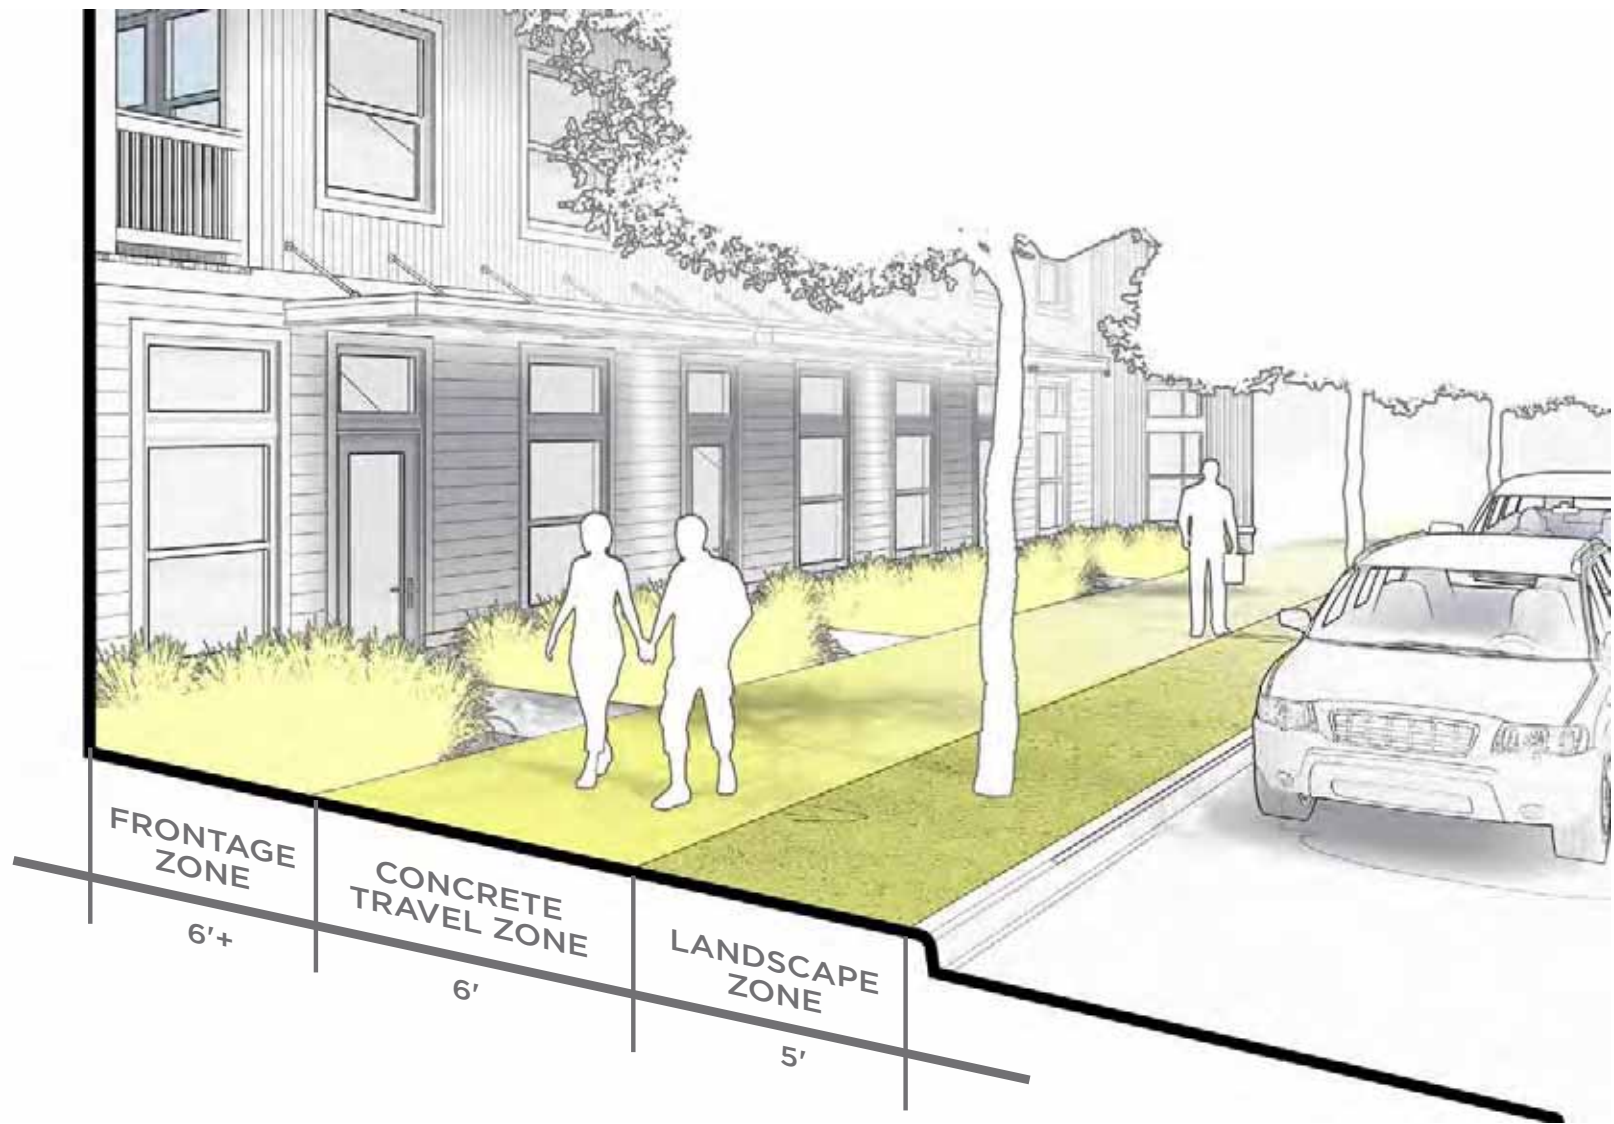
Proposed Neighborhood Streetscape Typology Section
